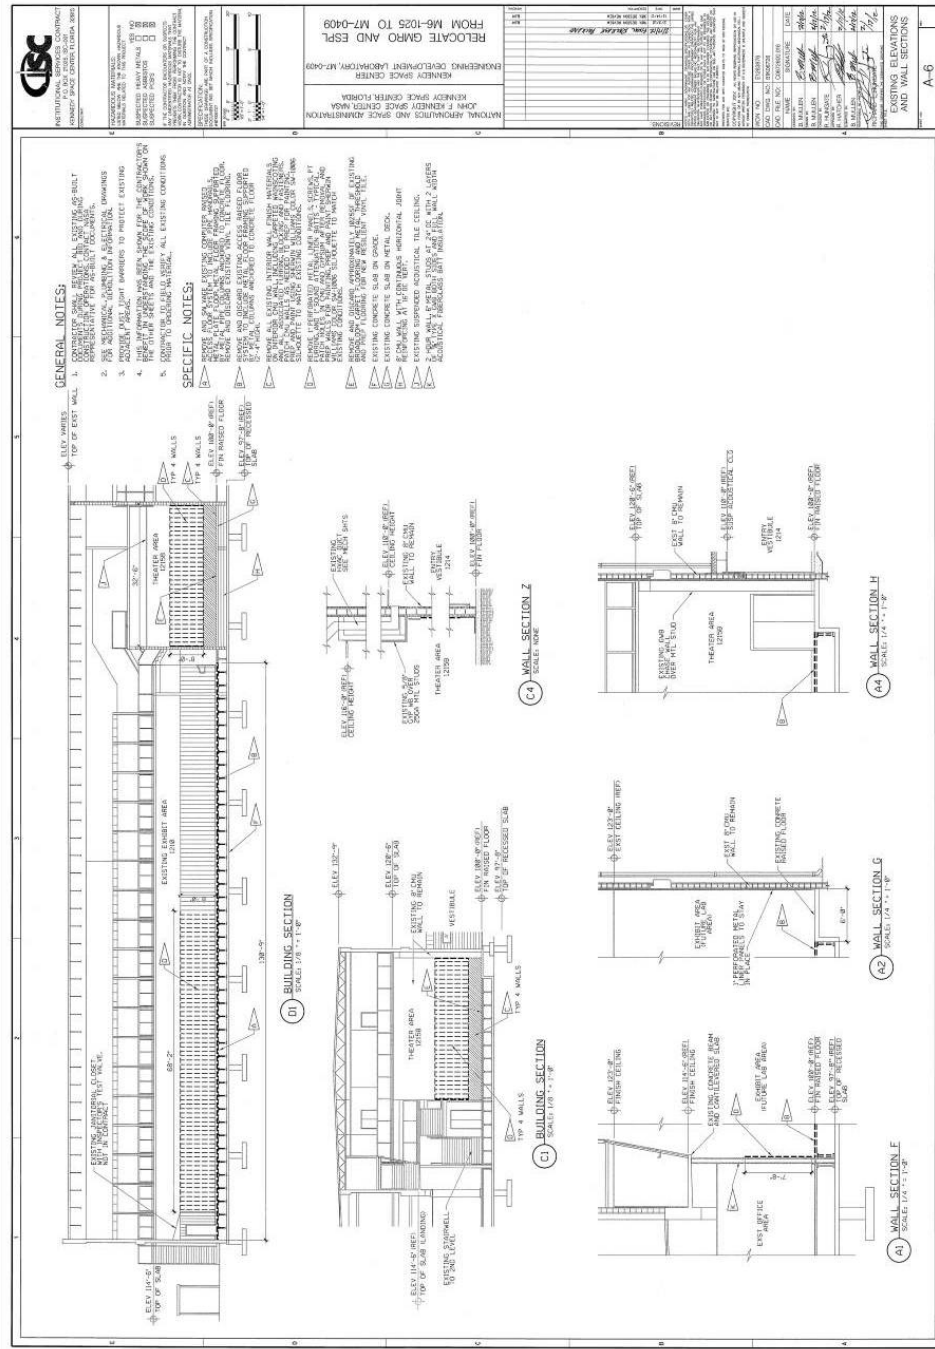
Institutional Services Contract, Relocate GMRO and ESPL, Existing Elevations and Wall Sections, February 2012, Sheet 16.
